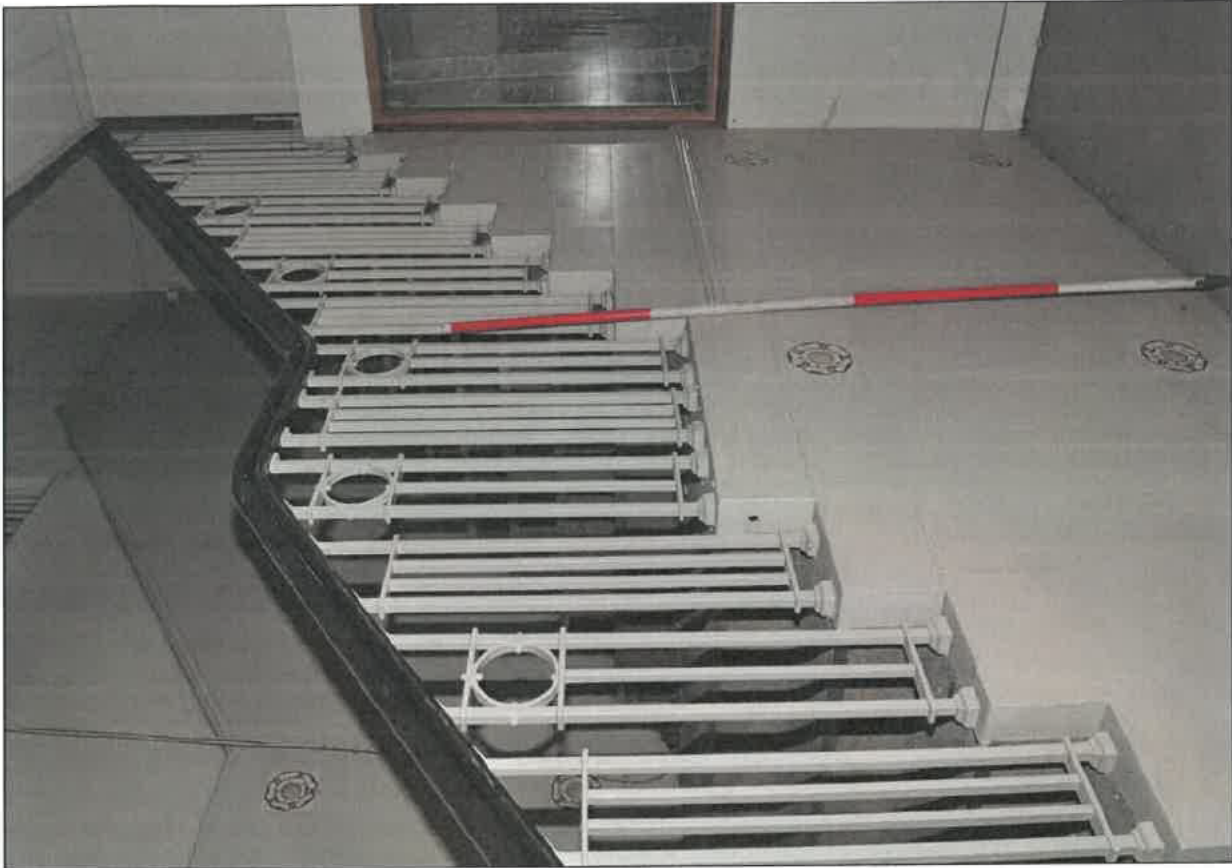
Ground floor: staircase in entrance lobby between numbers 1 and 3, looking south-east
